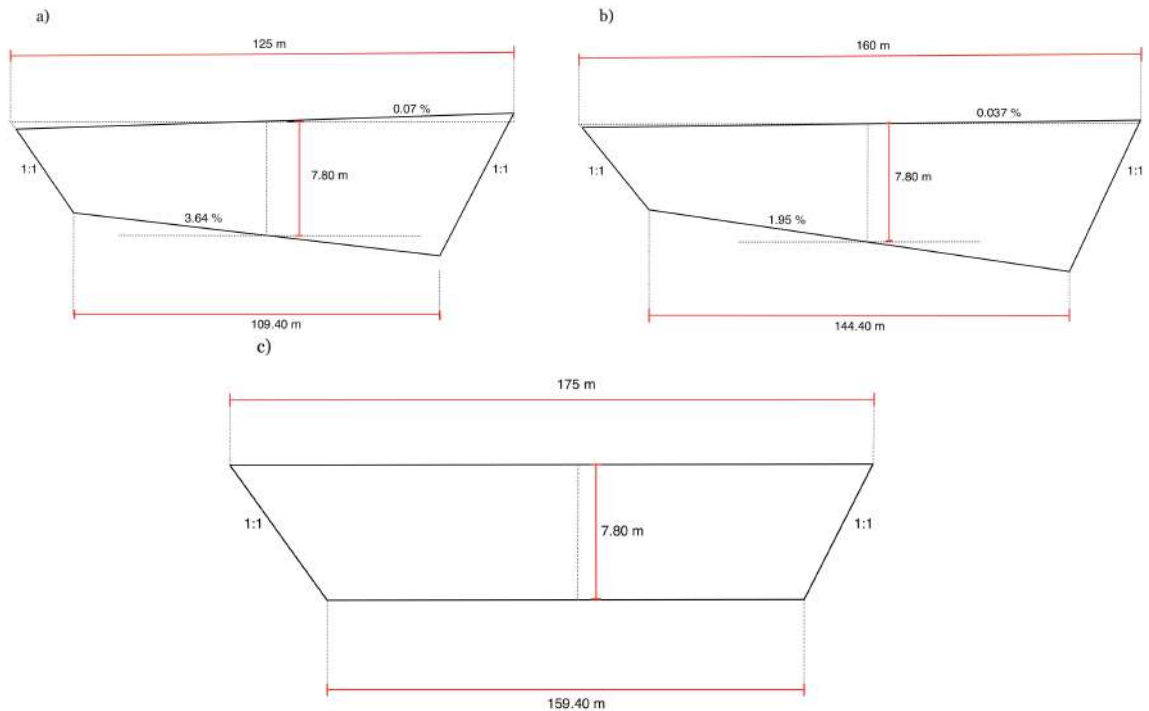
Representative cross-sections at a) meander bend exit, b) downstream of the 3rd Millennium Bridge and c) at the Bridge Pavilion. Figure not to scale.
